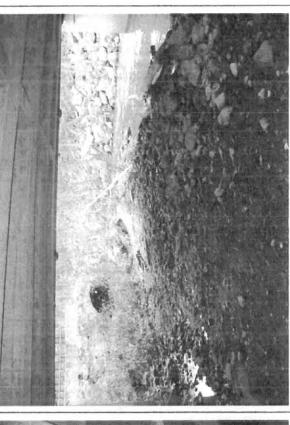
View of Heavy Silt & Stone Buildup Under Structure.
